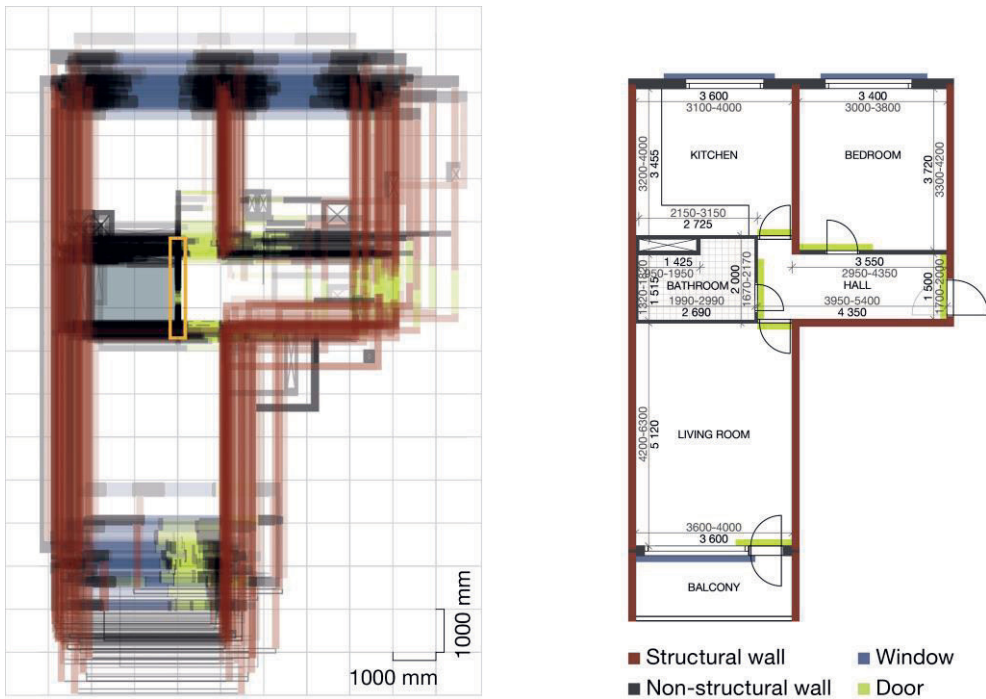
Stack of simplified plan drawings and the resulting typical plan for an apartment. Plan drawings have been aligned based on the circled bathroom wall. On the right, the typical dimensions and locations of rooms and other elements are presented as well as their common variation ranges. (Adapted from article II and Kaasalainen (2015, p. 188).)
